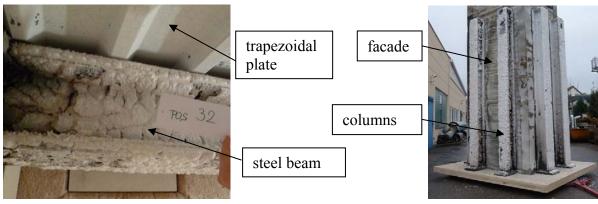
Loaded Beam with IC and trapezoidal plate after test
